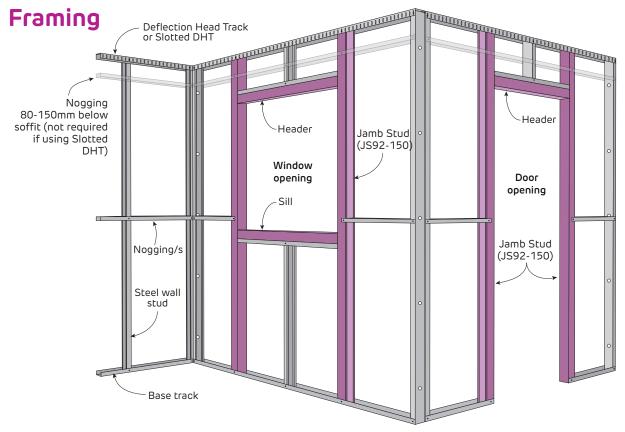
Typical External Steel Frame Wall with Window and Door Openings
